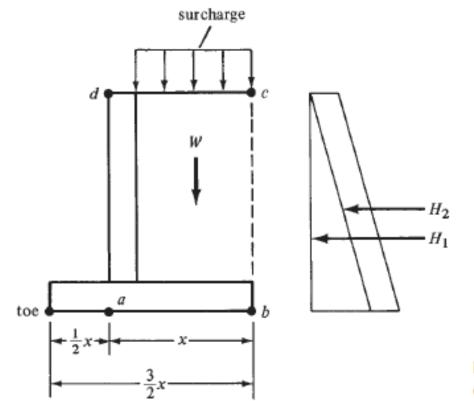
Forces acting on a cantilever retaining wall.
